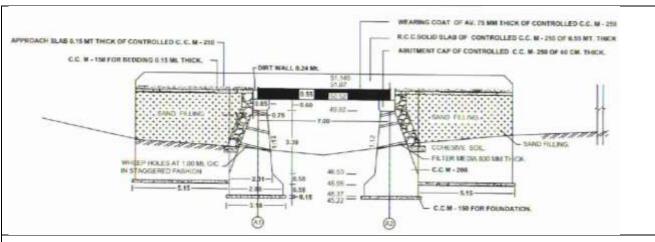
Typical Cross section – Plate 5 (Existing Causeway Elevated by Slab)
